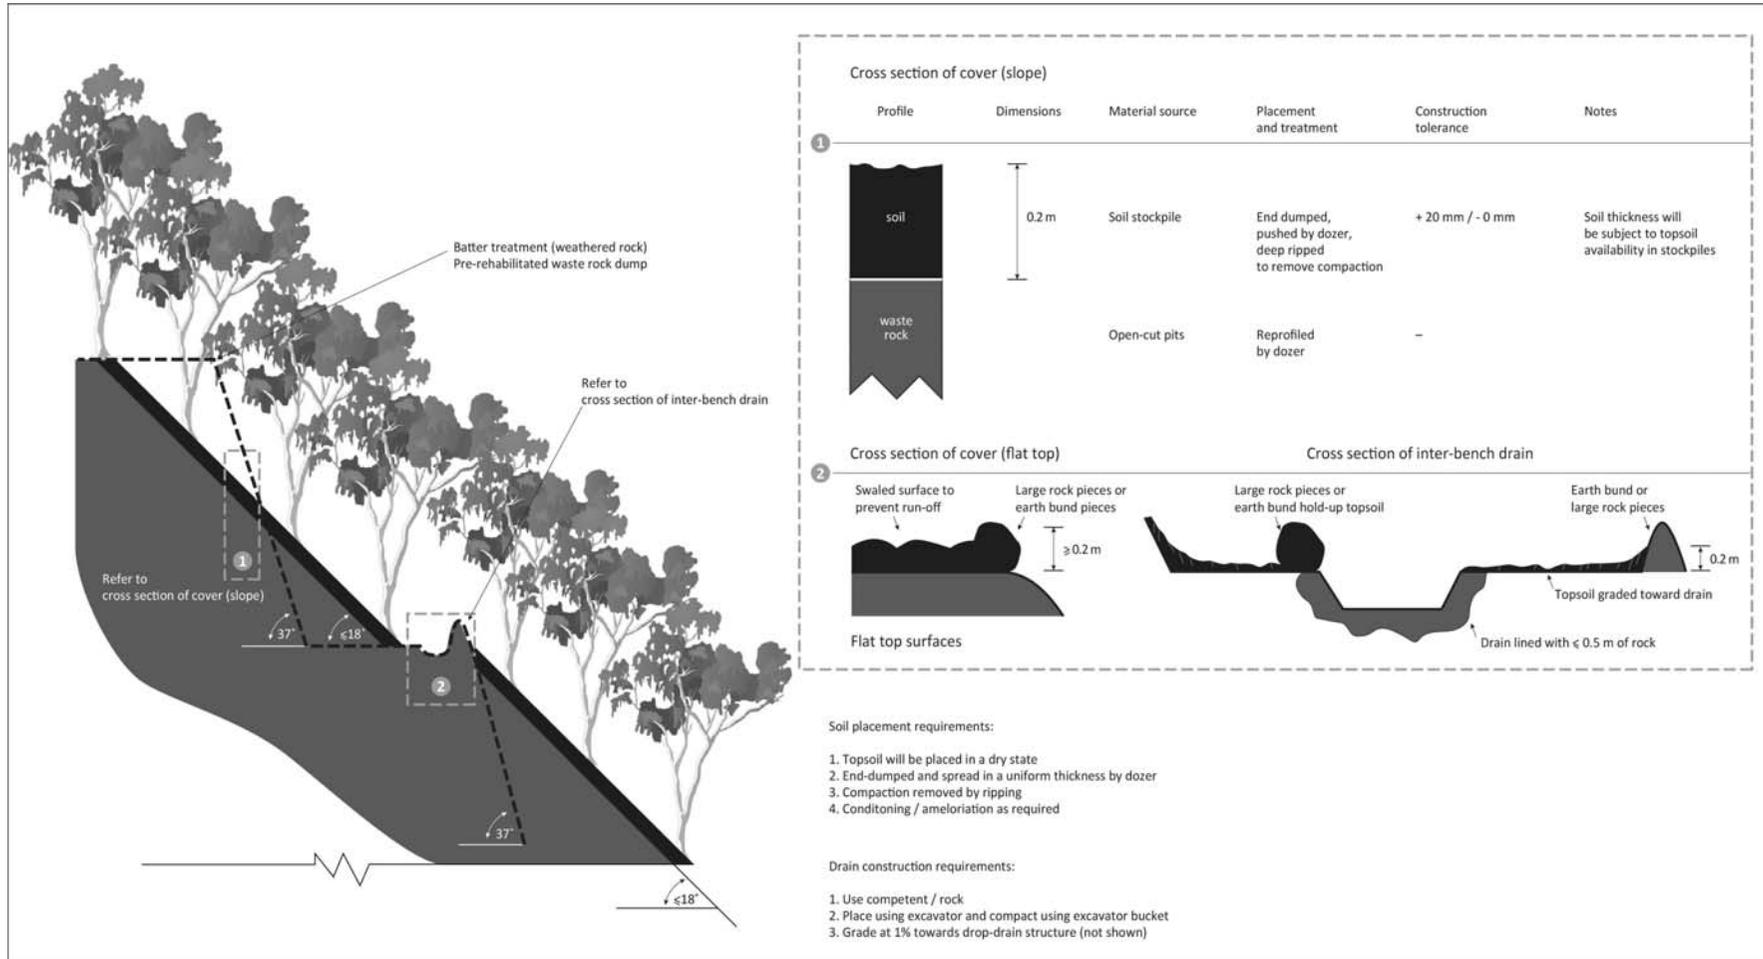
Proposed final landform for out-of-pit waste rock dumps
